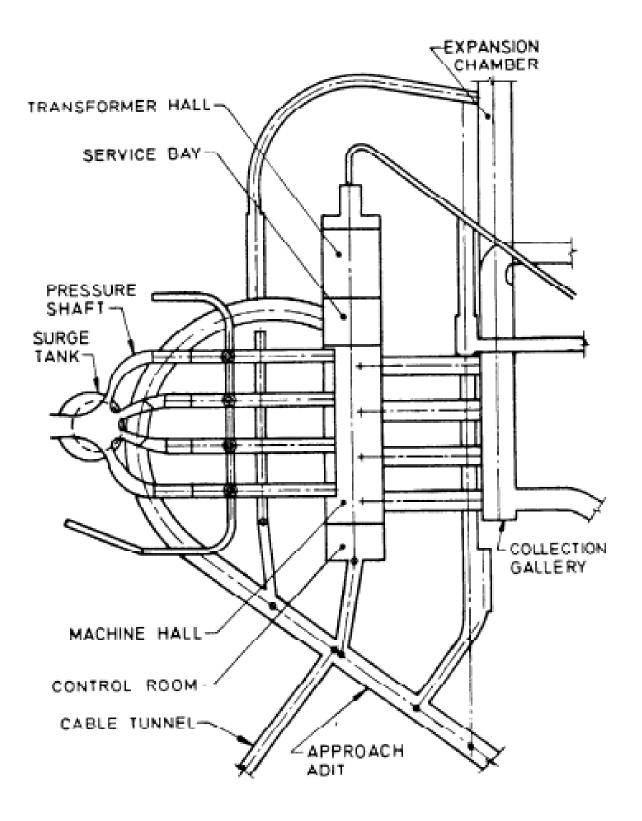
LAYOUT OF LINEAR ARRANGEMENT POWER STATION
